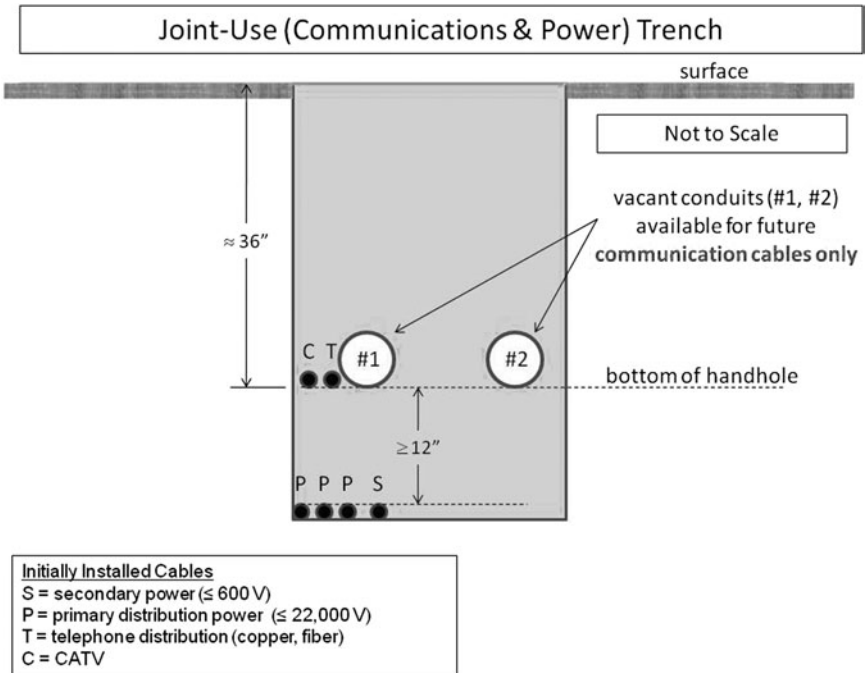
Joint-Use Trench, Including the Example BCN for Communication Only (Trench Backfill Details Not Shown; see Section 3.2.2.1).
